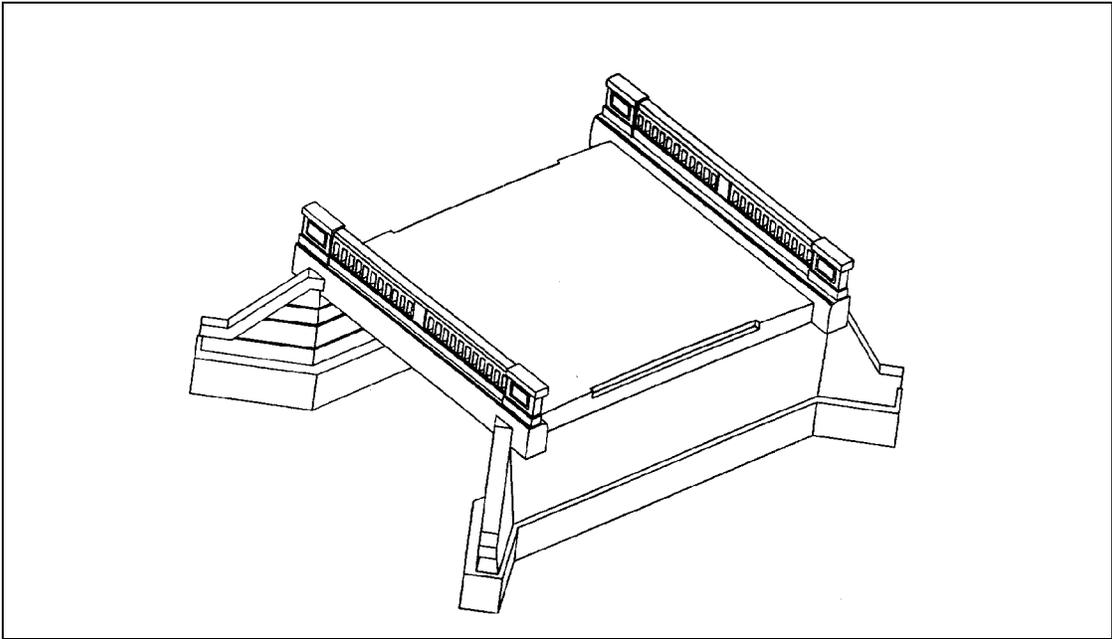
Isometric view of slab structure (Source: Maryland State Roads Commission, 1930 Standard Plans).
